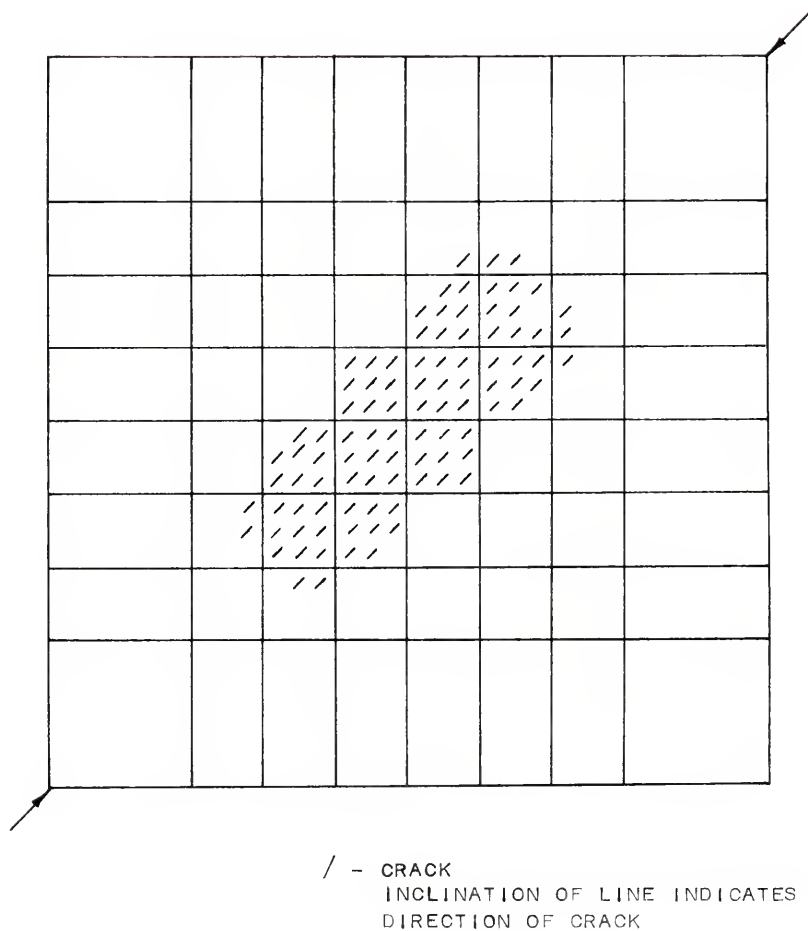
Crack pattern of square concrete panel at 199,000 lbs.
